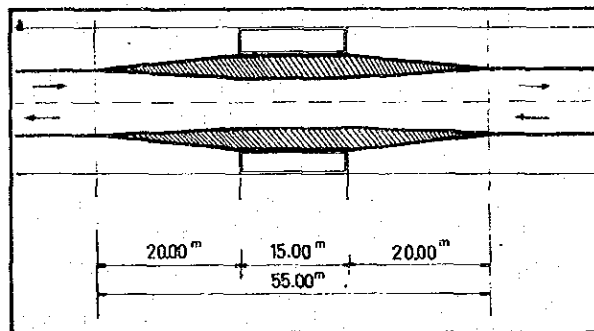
SITE PLAN OF BUS-STOPS Unit: in meters
